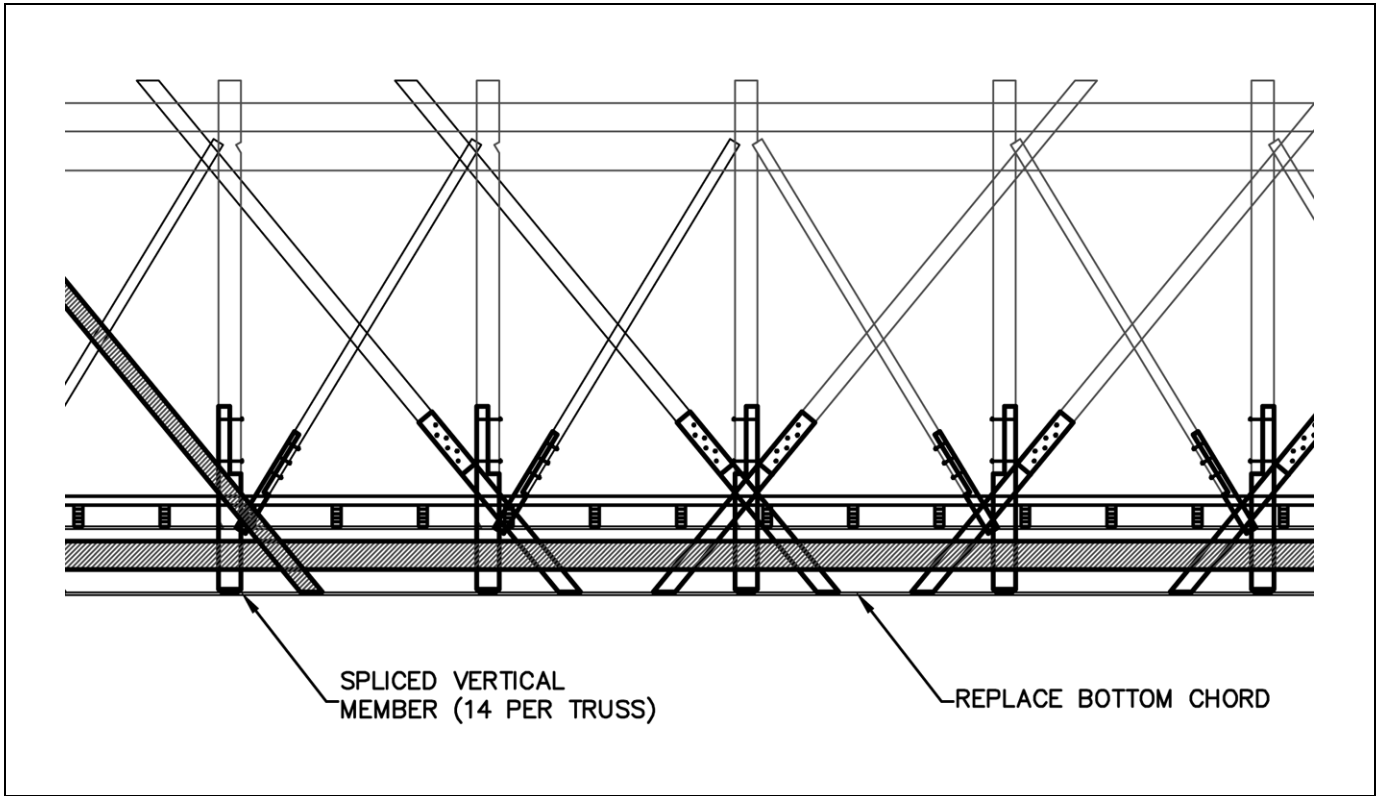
Proposed repairs to vertical truss members (source: HEB 2012)
